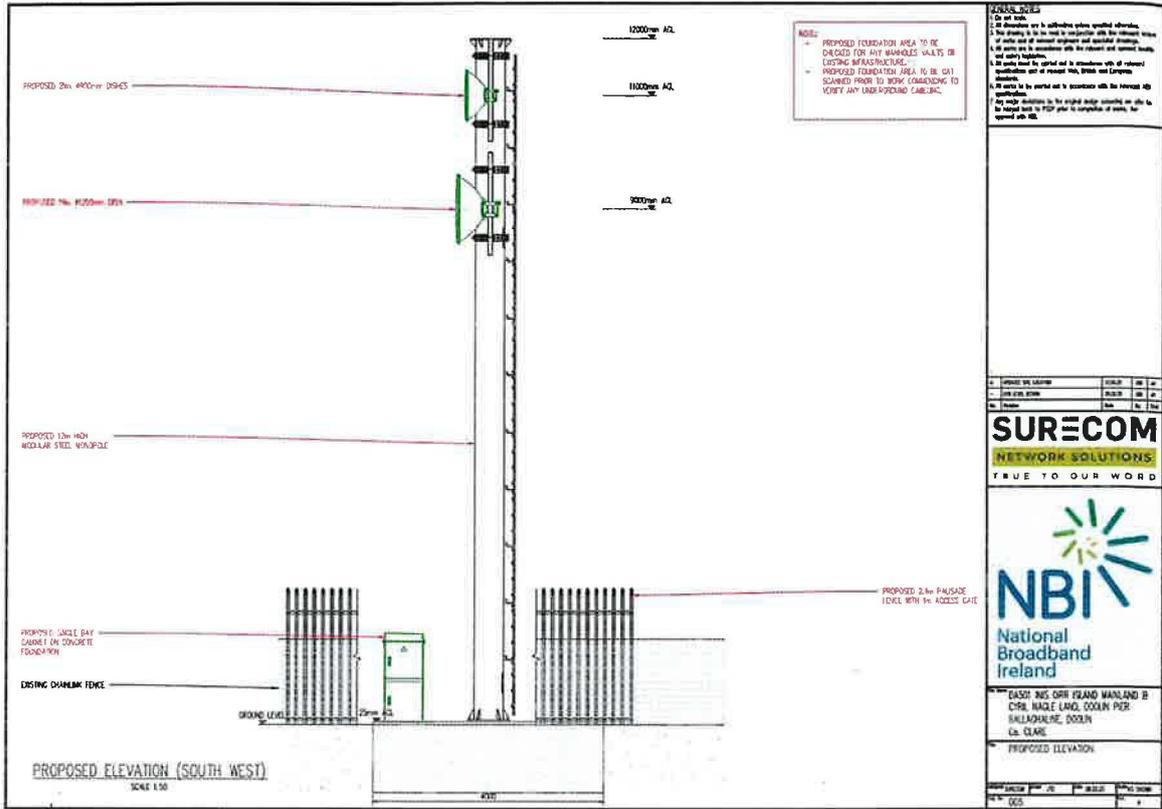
PROPOSED ELEVATION (NBI, 2025)
